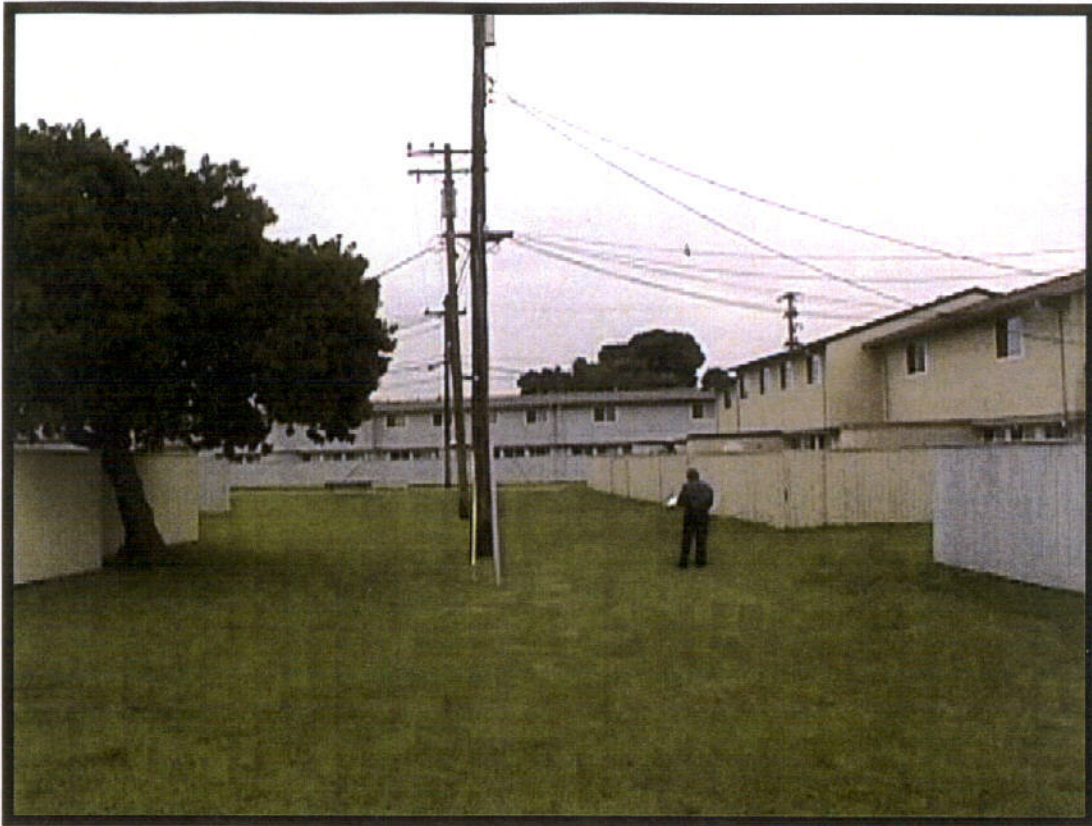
Facing east from southwest corner of the site. Note grass-covered common area between buildings and telephone pole utilities.
